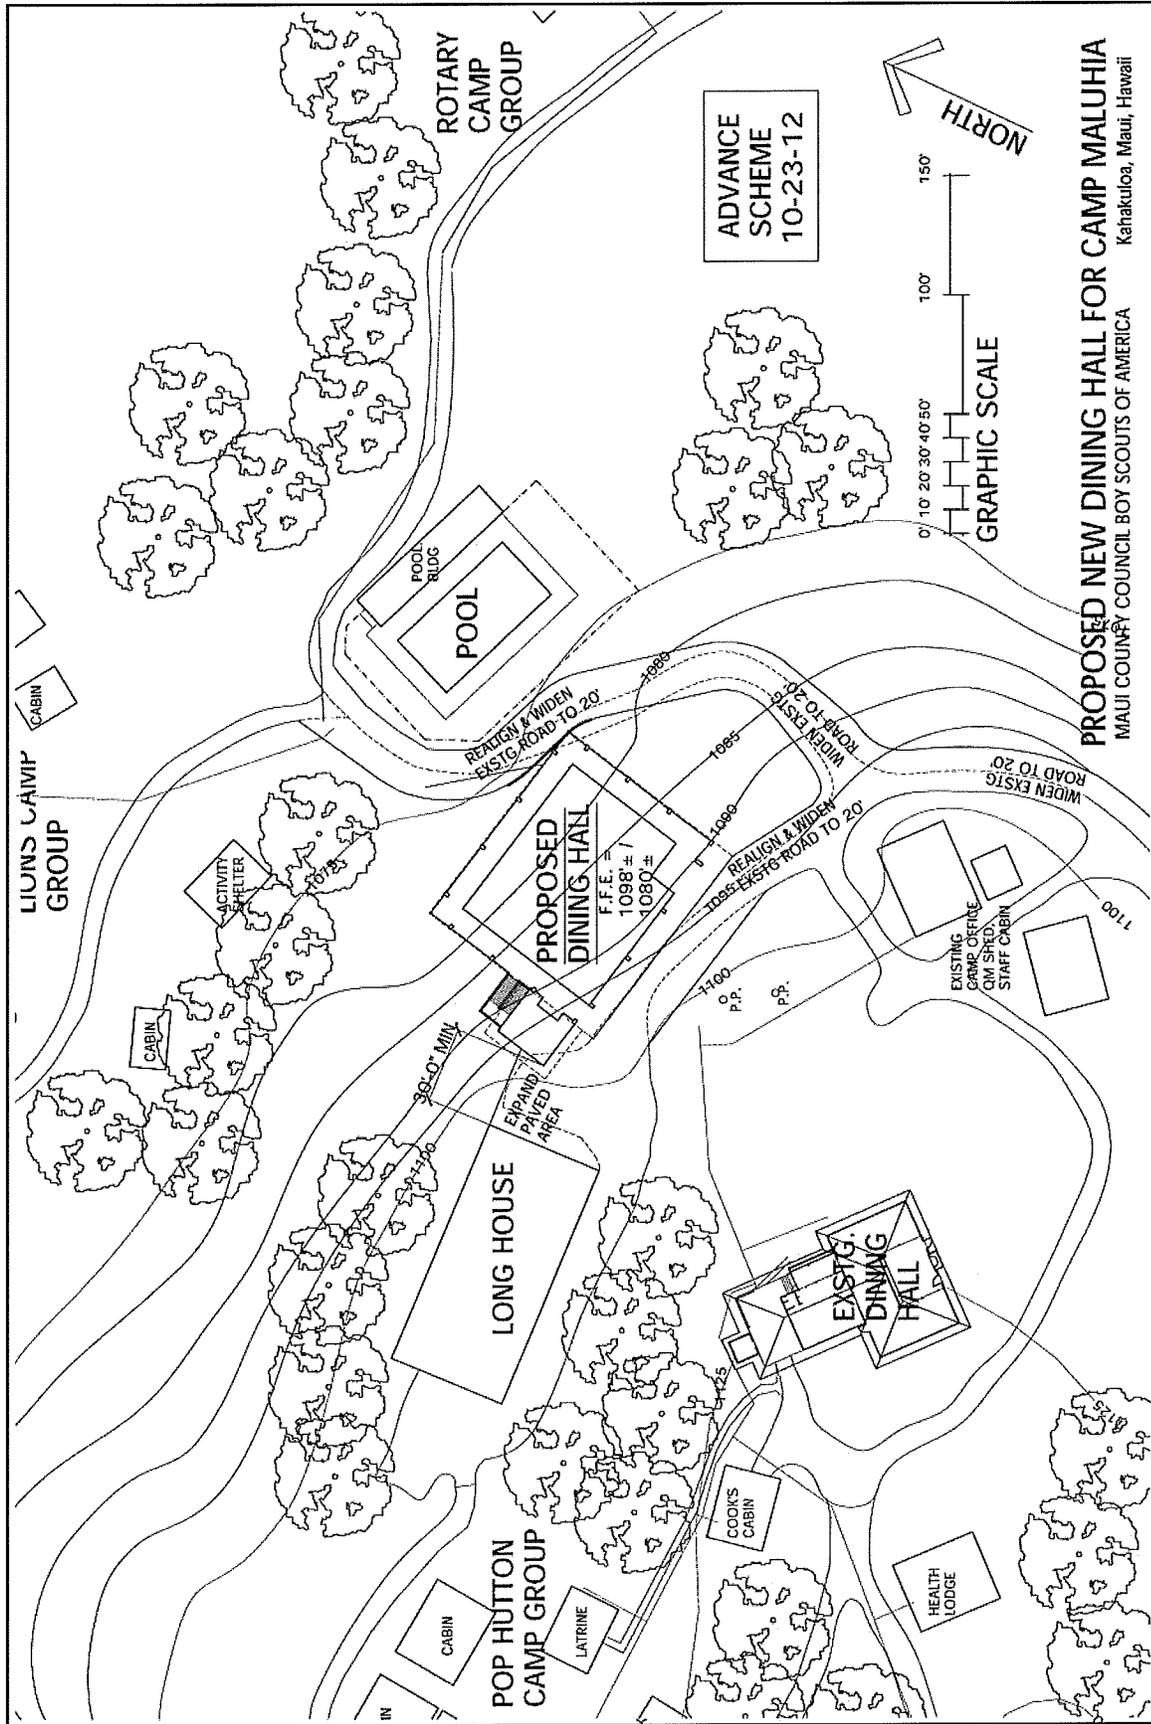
Plan of Proposed Dining Hall (Courtesy of Munekiyo and Hiraga).
